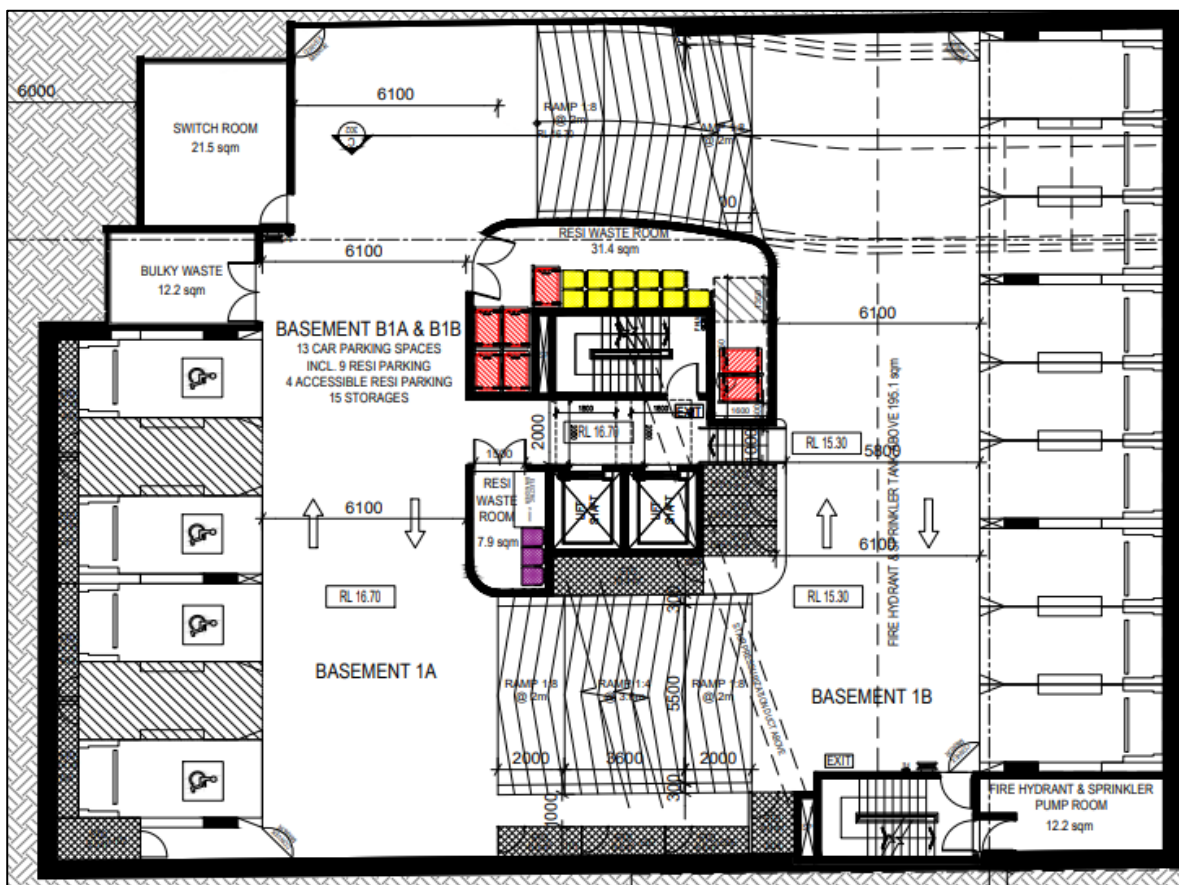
Extract of applicants submitted Basement Level 1 Plan.
